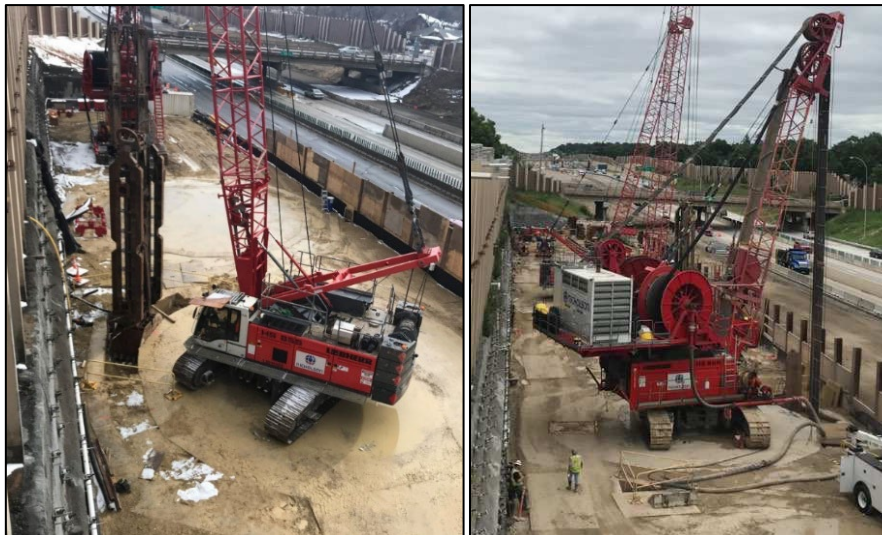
Cell 2 Diaphragm Wall Excavation with Clamshell (left)
